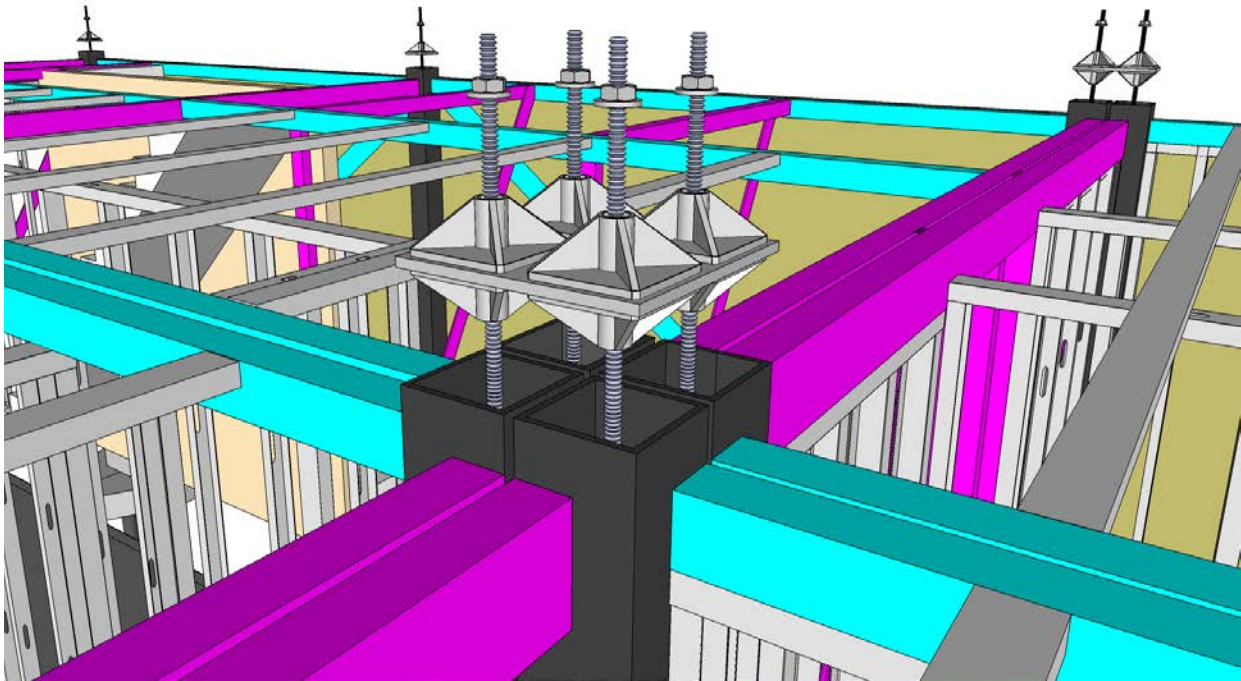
Connection plate to connect all four modules side by side and allow for stacking of second floor modules
